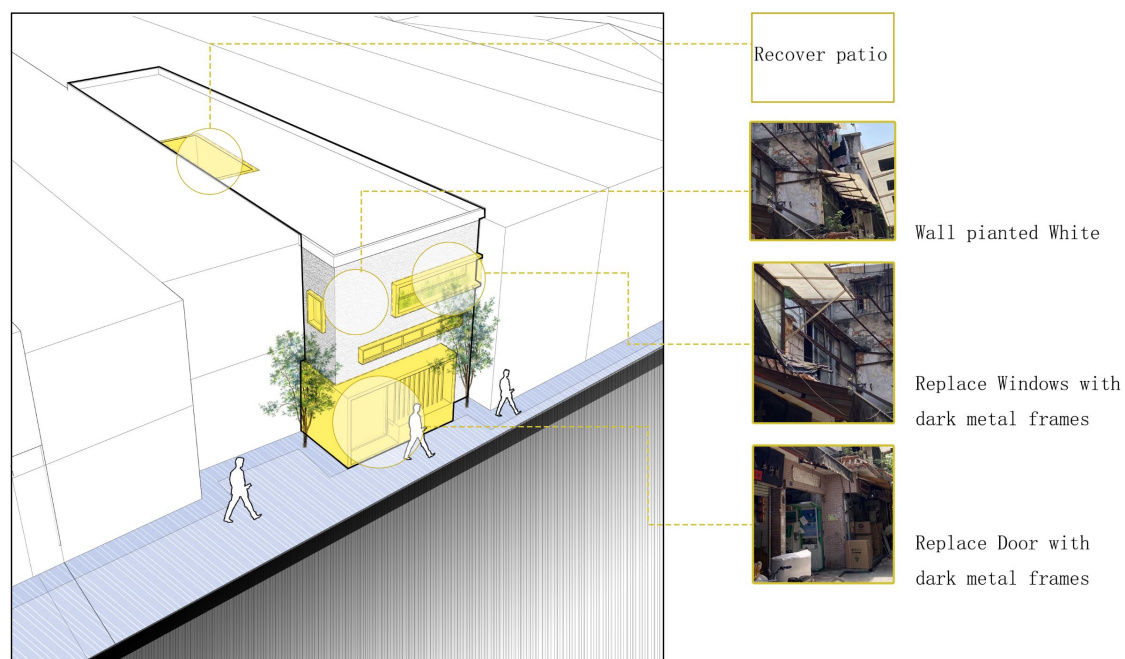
Guiding plan for the renewal of the building with a modern approach
